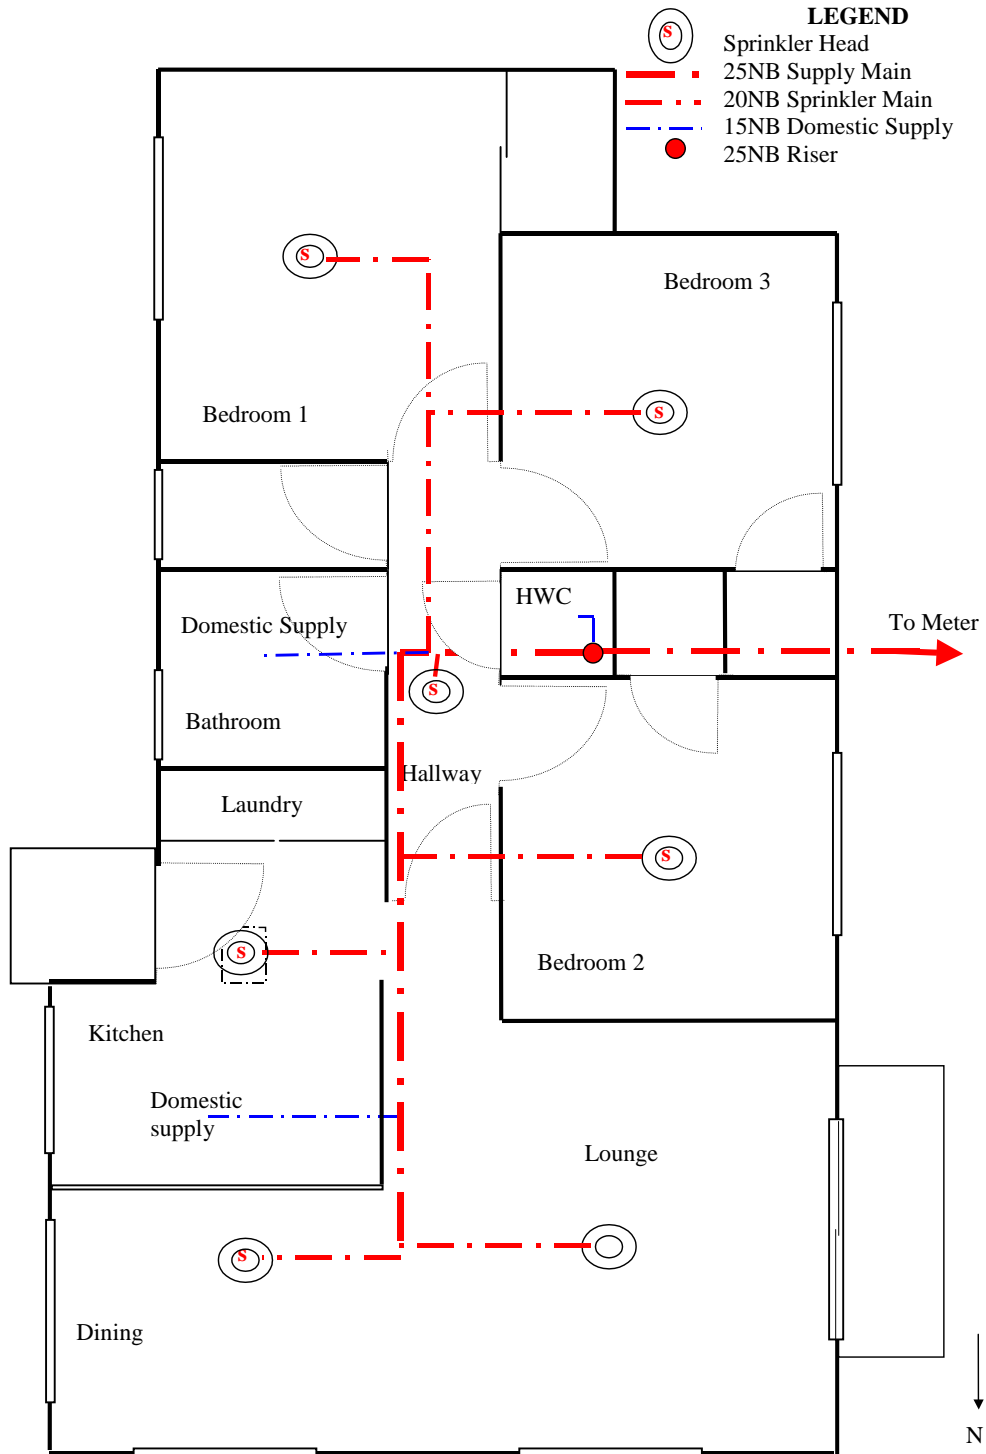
Plan View of Multi-Purpose Sprinkler System – Three-Bedroom Home
